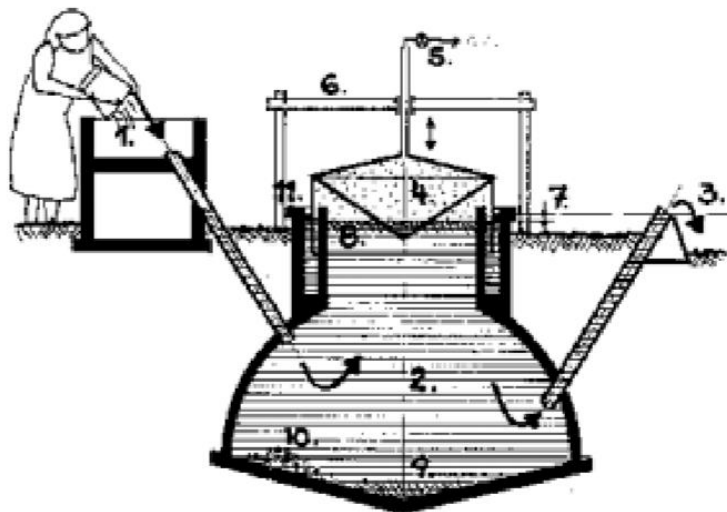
Floating-drum plant 1. Mixing tank with inlet pipe. 2. Digester. 3. Overflow on outlet pipe. 4. Gas holder with braces for breaking up surface scum. 5. Gas outlet with main cock. 6. Gas drum guide structure. 7. Difference in level due to gas pressure inside the digester. 8. Floating scum in the case of fibrous feed material. 9. Accumulation of thick sludge. 10. Accumulation of grit and stones. 11. Water jacket with oil film (Sasse, 1988)
